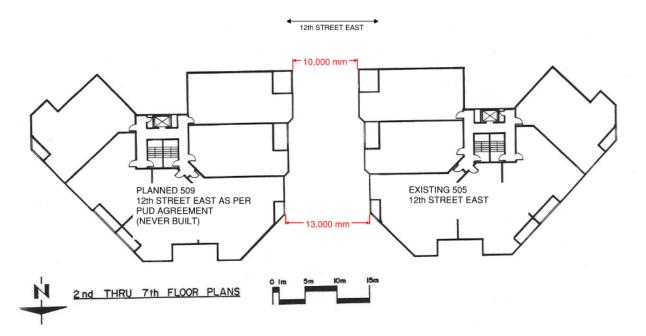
PUD AGREEMENT PLANNED BUILDING SPACING BETWEEN 505 AND 509 12TH STREET EAST.
